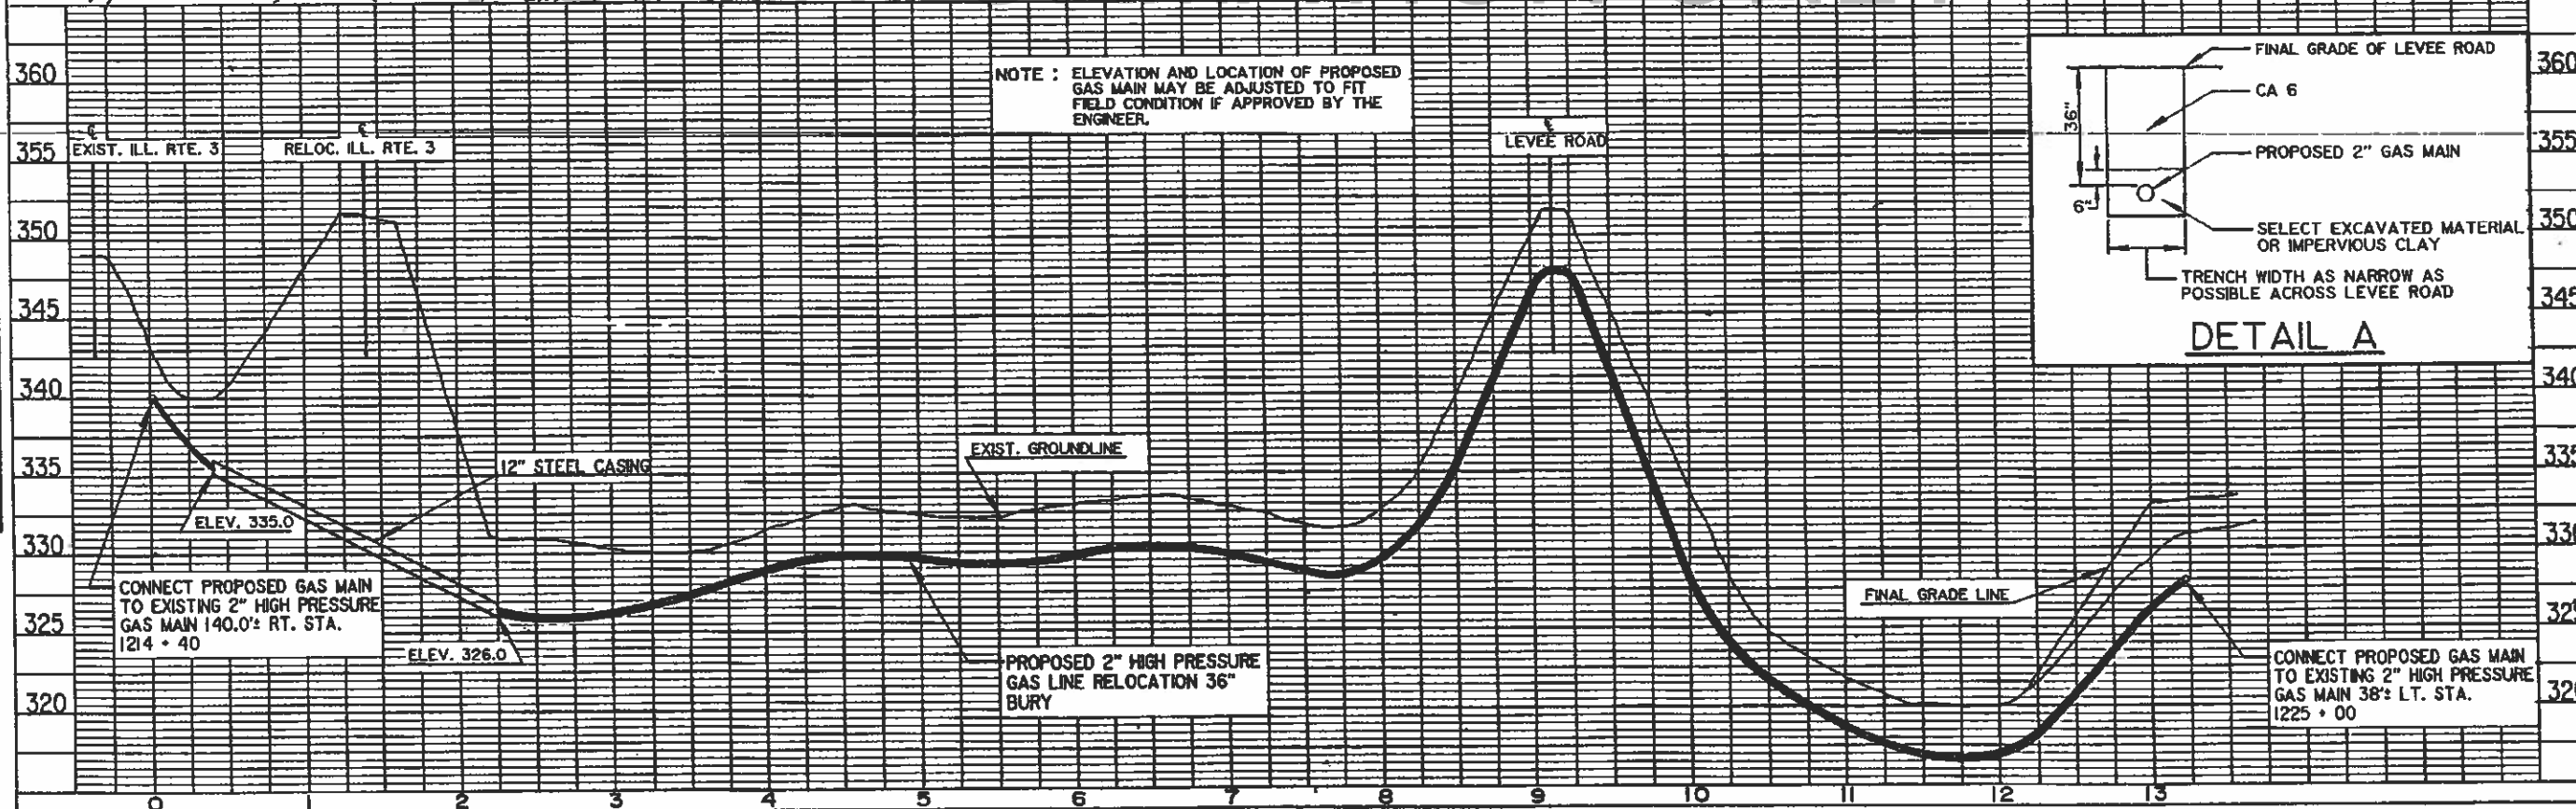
SINGLE PLAN AND PROFILE SHEET
